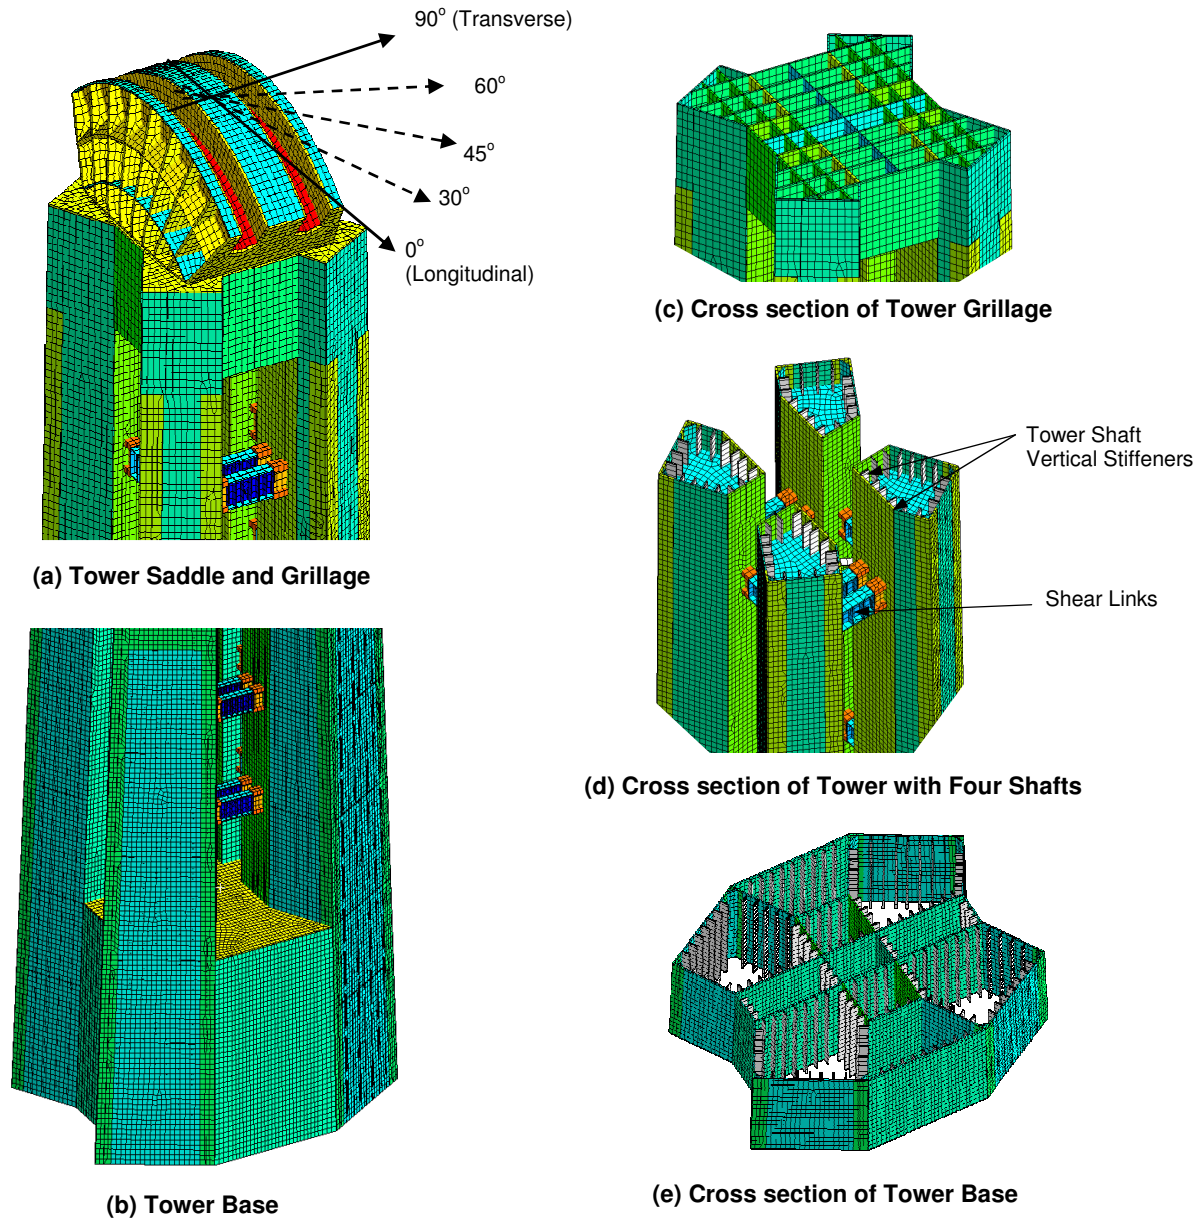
Finite Element Model of the SAS Bay Bridge Tower with Details of the Cross Sections
